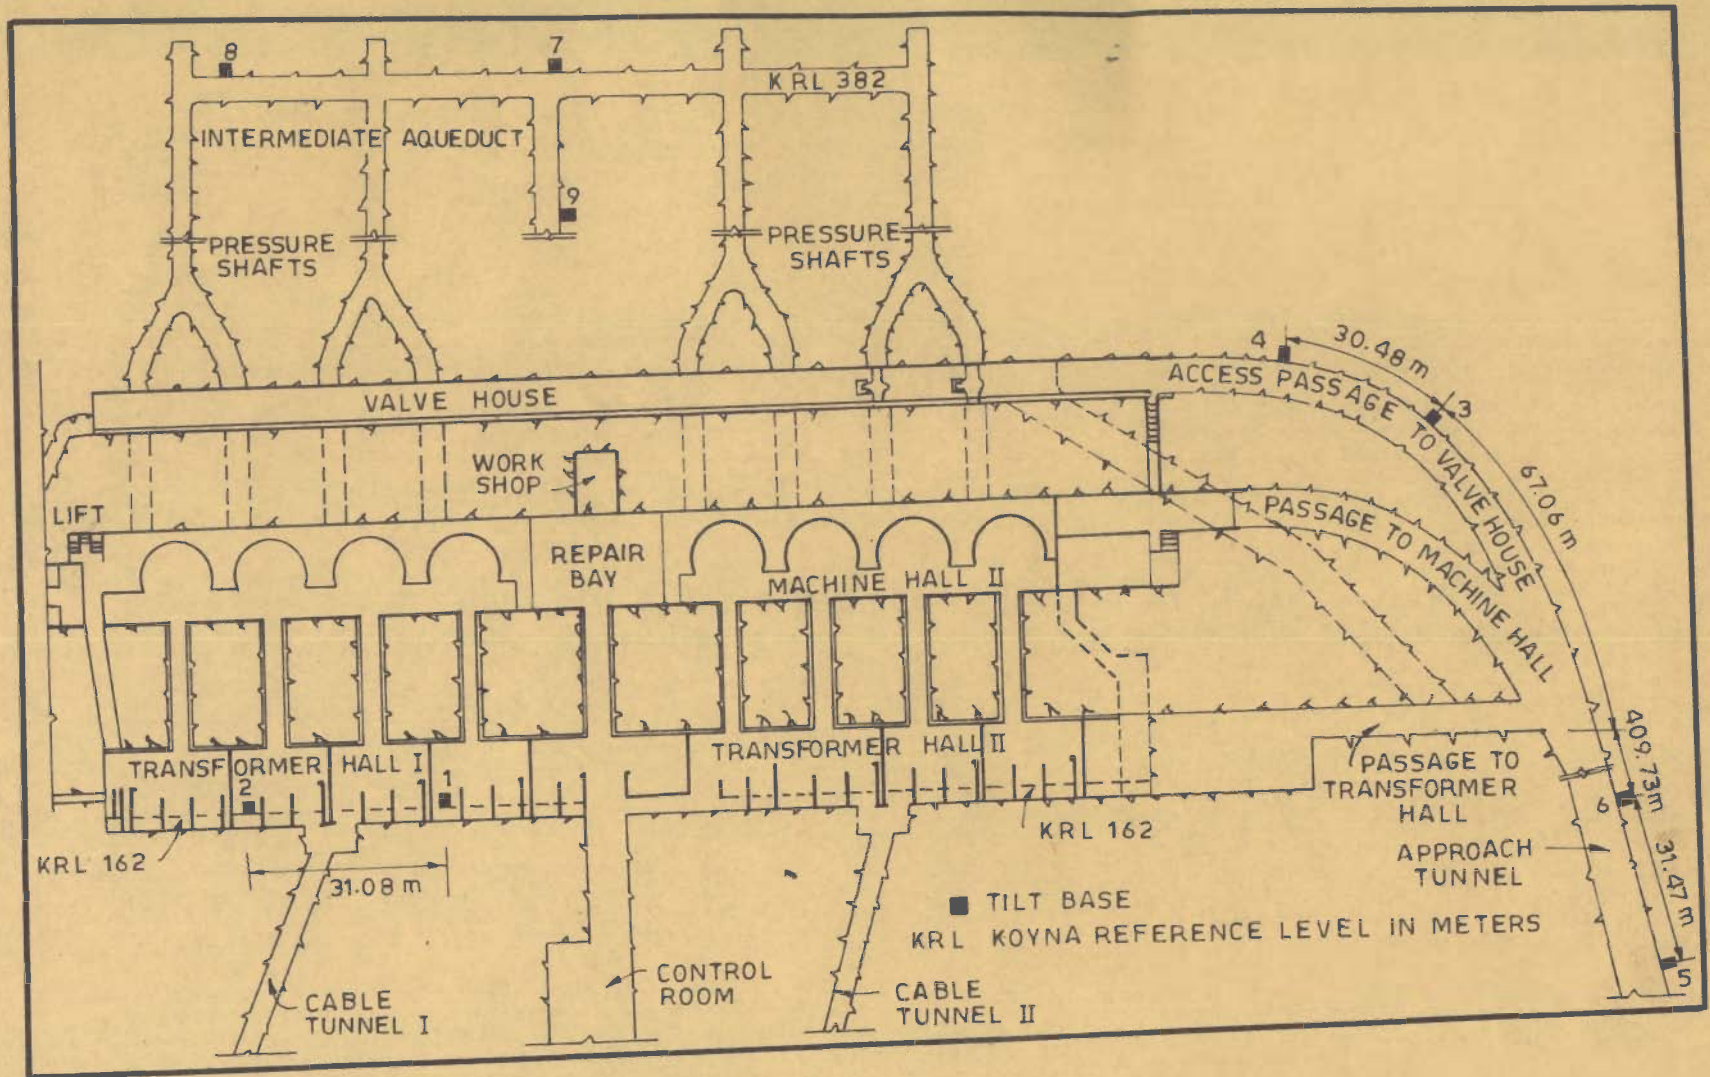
LAYOUT PLAN OF THE UNDERGROUND POPHALI POWER HOUSE SHOWING LOCATIONS OF THE TILT BASE-HUB INSTALLATIONS
